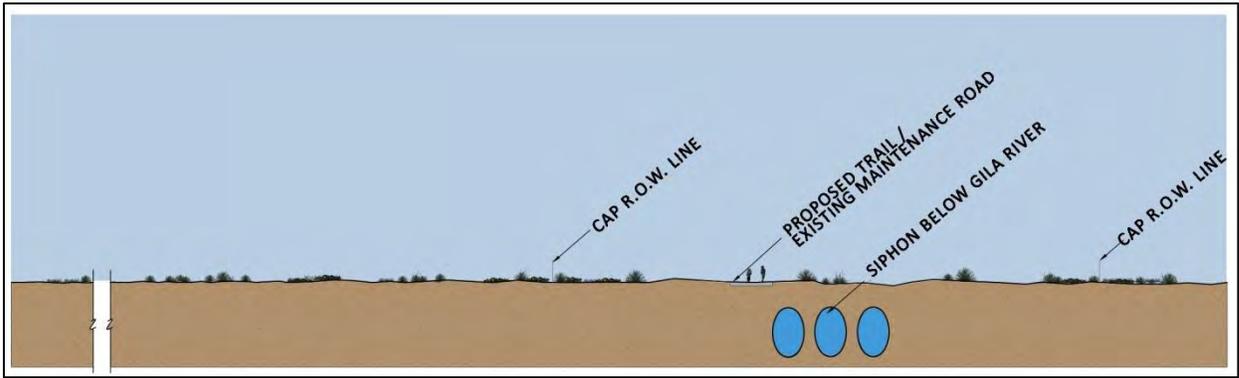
F: Cross Section GRS-1 - Typical of Mile Post 0.0 to Mile Post 0.5
